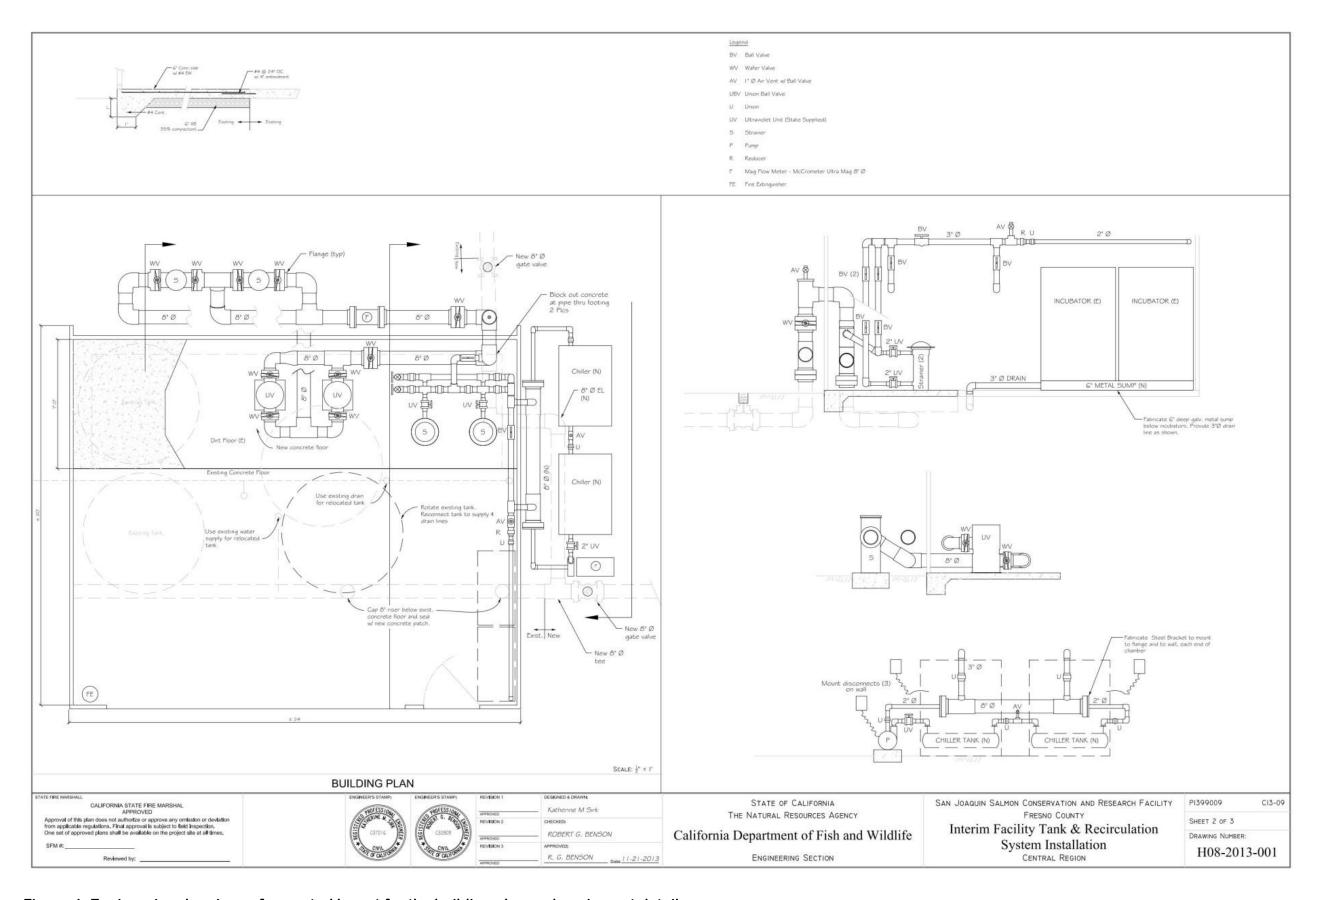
Engineering drawings of expected layout for the building plan and equipment detail
